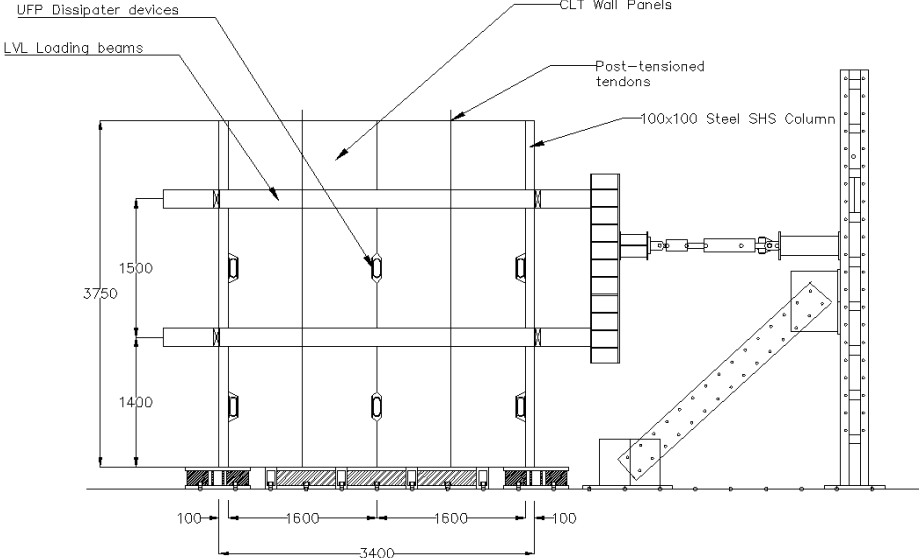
Side elevation of the High seismic option consisting of CLT wall panels, UFP devices and steel SHS corner columns. LVL loading beams included
